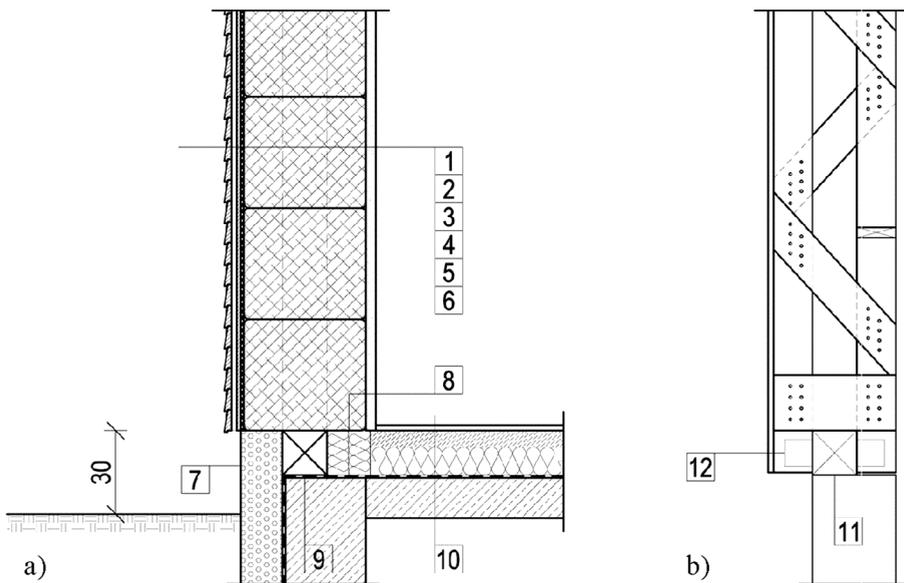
Details of straw bale wall support on the reinforced concrete foundation: a) finished wall, b) wooden structure made from boards connected with nails; 1 – wooden shingle, 2 – ventilated air gap, 3 – planking, 4 – wind insulation, 5 – straw bales and wooden structure, 6 – clay plaster, 7 – thermal insulation XPS, 8 – thermal insulation EPS, 9 – damp-proof course, 10 – layers of flooring on the ground, 11 – wall plate, 12 – angle bracket
